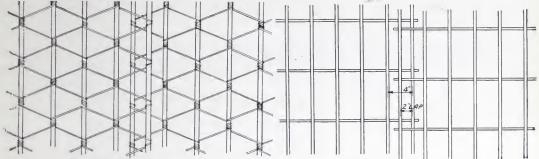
Detailing Widths of Mesh and showing extra strip of mesh over the girders.
